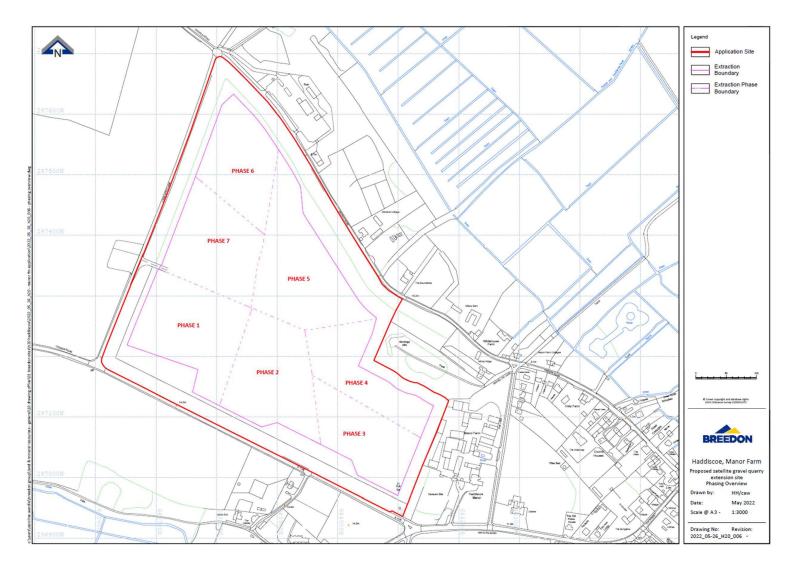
Proposed Site Phasing (Source: Submitted Planning Application Drawings)
